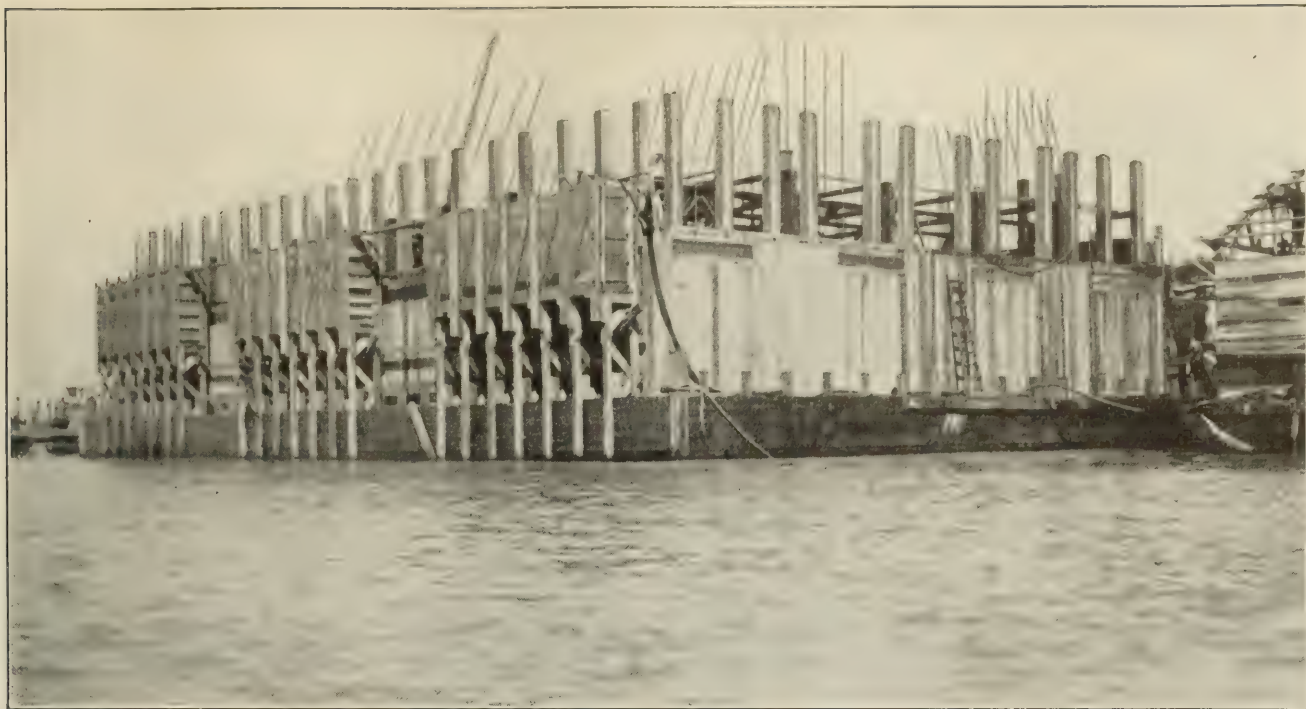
CAISSON 6 IN THE PONTON, ABOUT TO BE LAUNCHED
